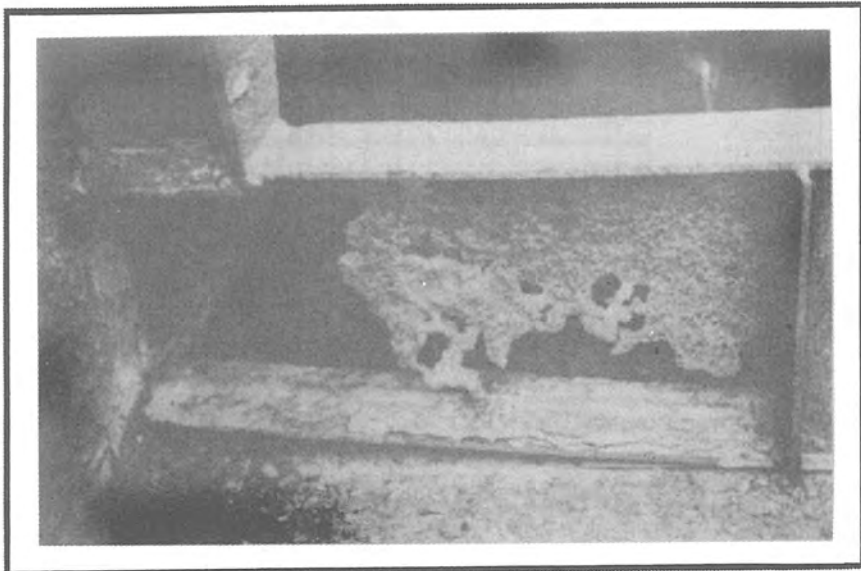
DISTILLER 1B CORRODED ROOF I- BEAM
